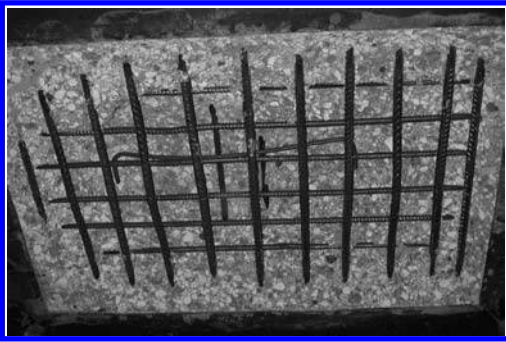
Reinforced concrete test panel after fire ingress showing heavy material loss due to spalling (Kusterle 2004).
